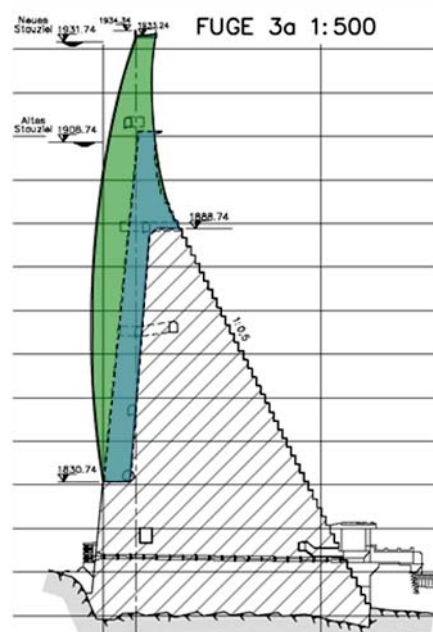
Typical cross-section of Spitallamm arch-gravity dam (in blue: existing dam concrete to be removed; in green: heightening project)
